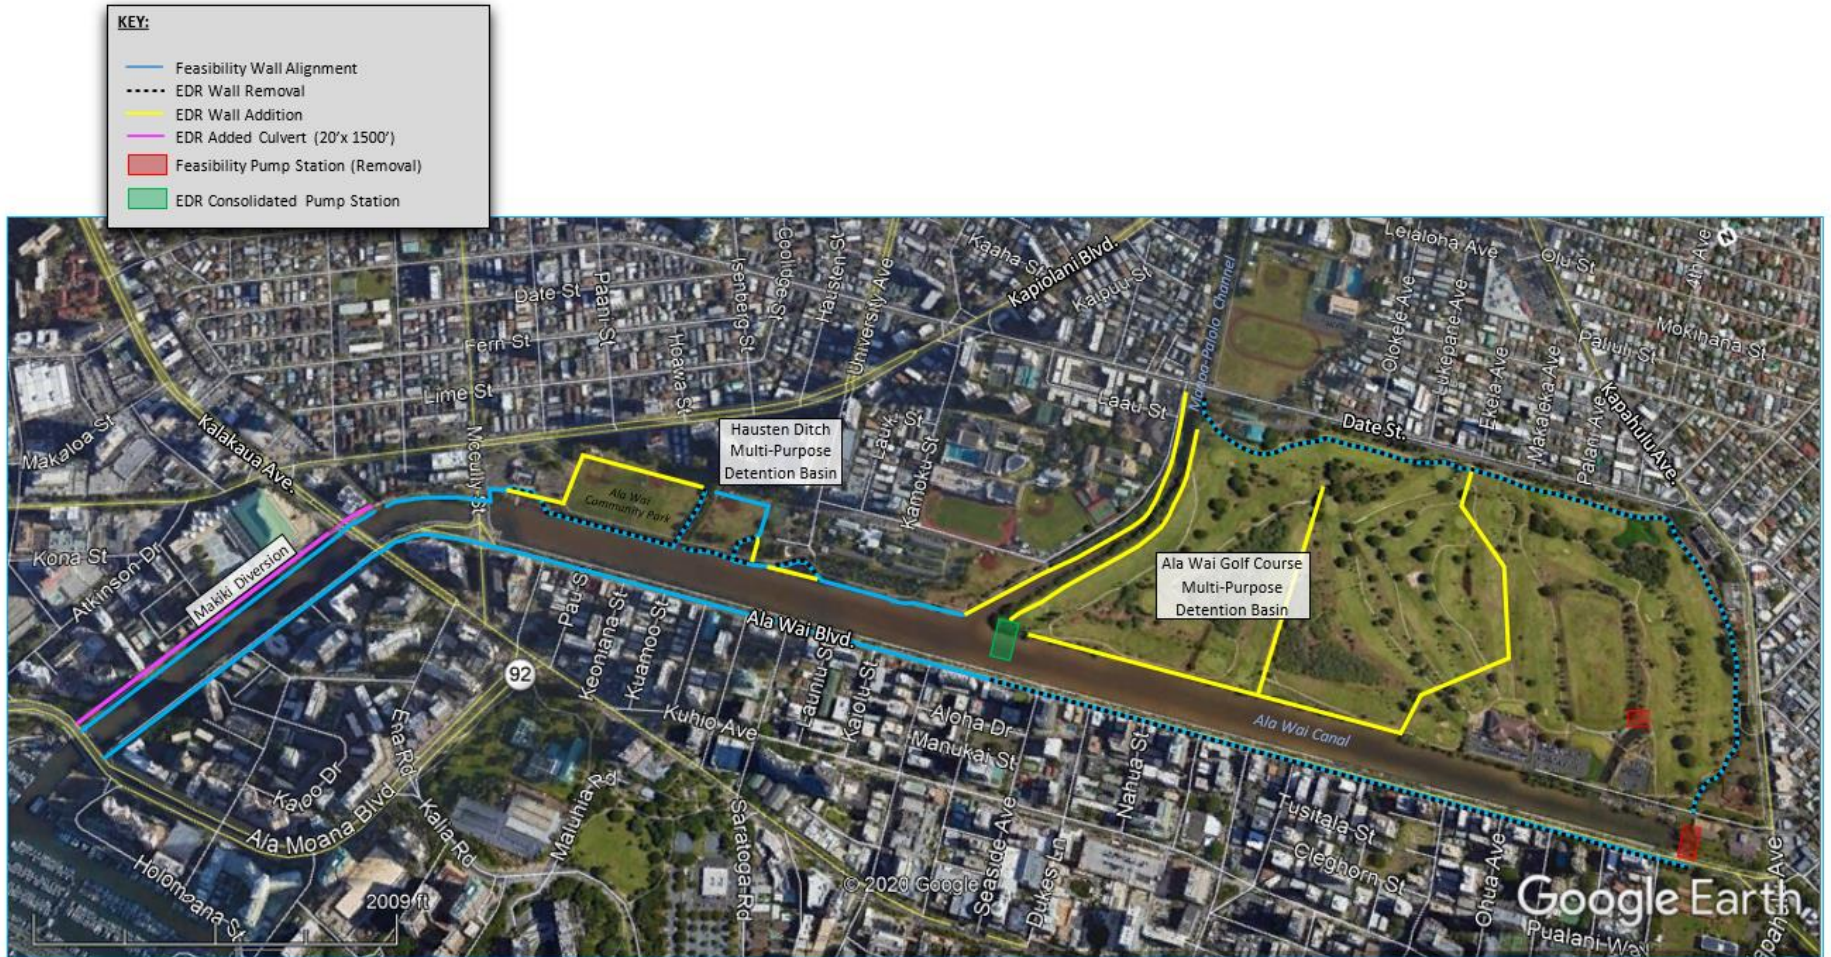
Flood barrier system modifications and alignment in the lower watershed.
